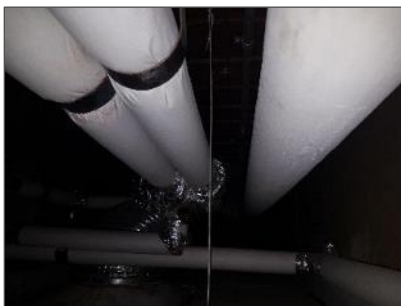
Non-asbestos fibreglass pipe insulation above ceiling tiles in classrooms.
